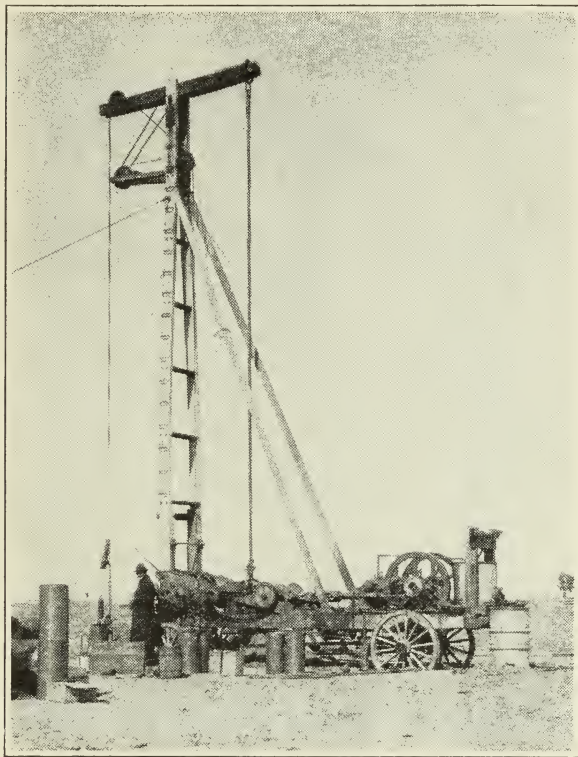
Cable-tool drilling rig. Stovepipe casing sections in left foreground.
